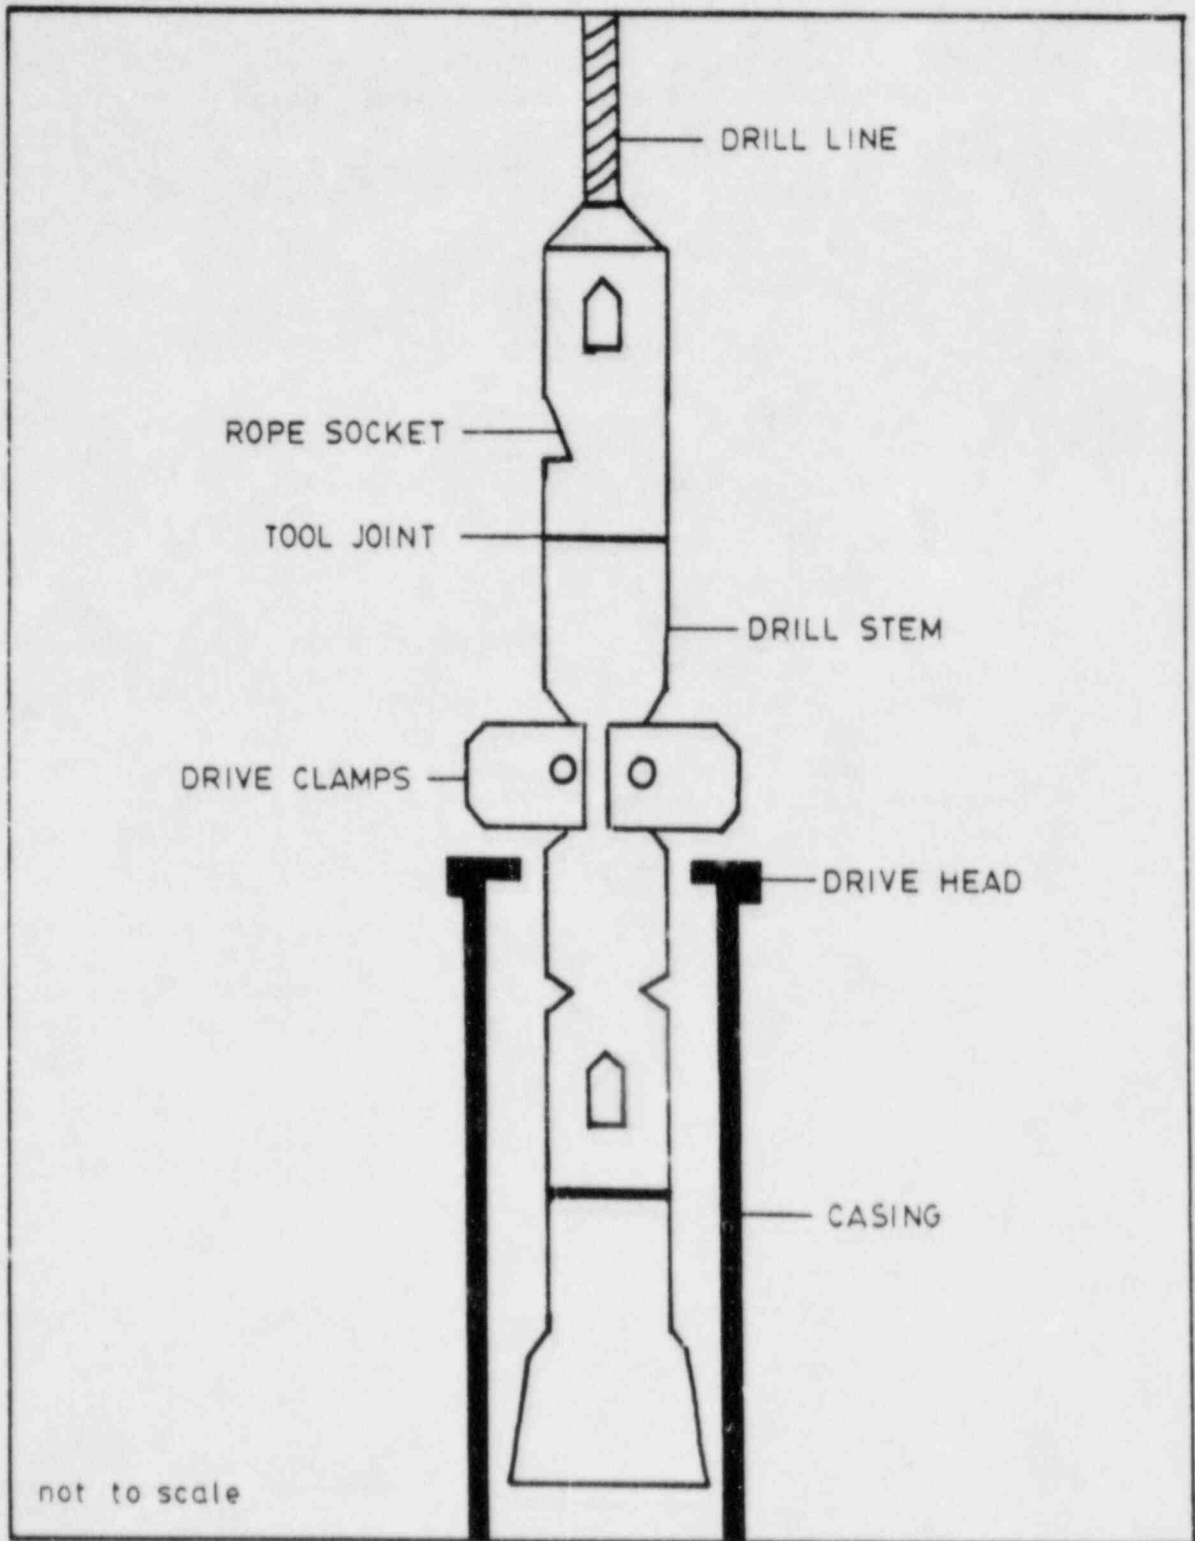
Hole 83-4E: diagram of tools used for driving casing.
